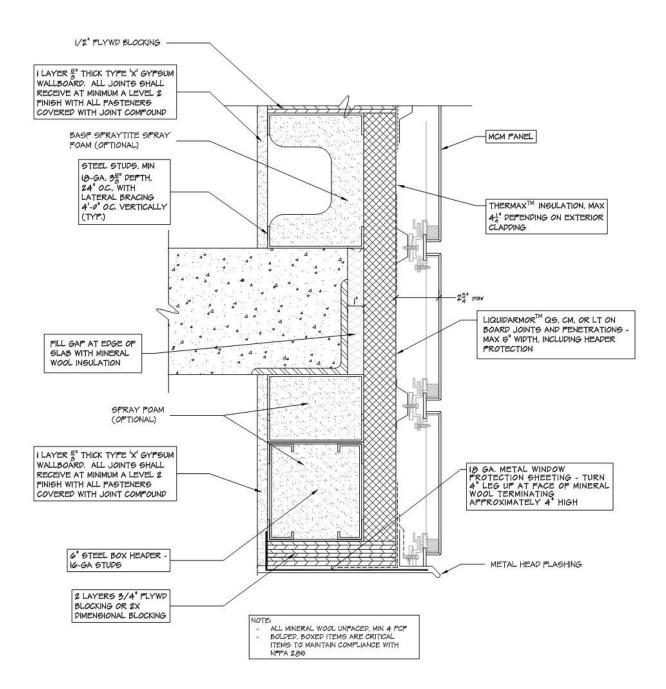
Required Opening Head Protection When BASF SPRAYTITE® 81206 Spray Foam Is Used in the Cavity (Infill Wall Construction with ACM Façade)
